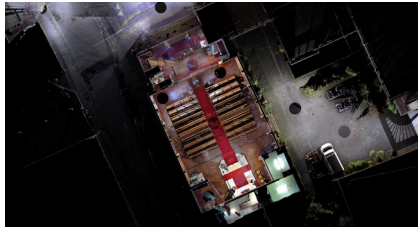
First-floor plan of the church. (Source: courtesy of E. Savvidis and M. Daouti).
